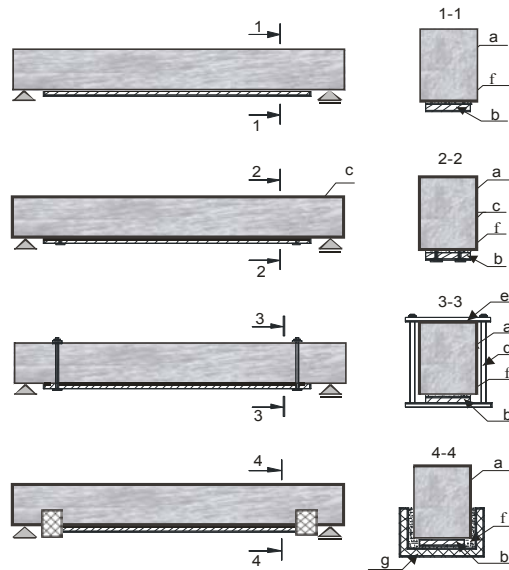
Strengthening of RC beams with FRP soffit plates. a- concrete; b-FRP plate; c- anchor bolts; d, e - elements of the metallic jig; f - adhesive layer
